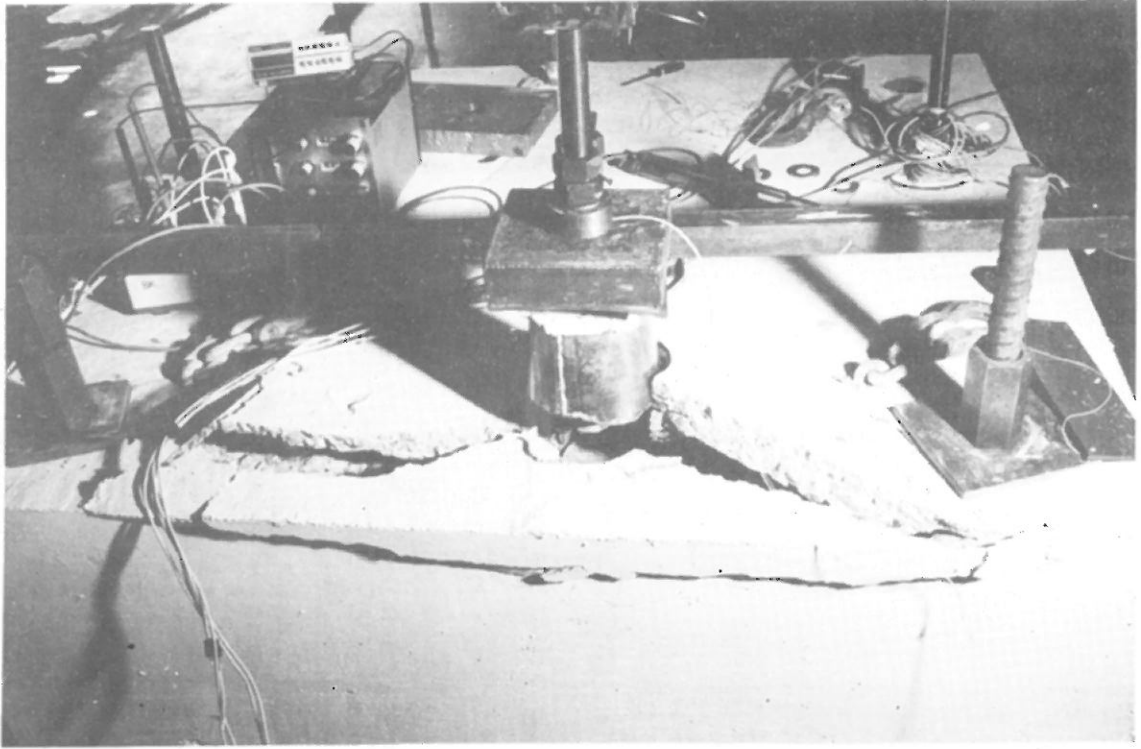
Anchor bolt SC 1:4 after failure (continued)
